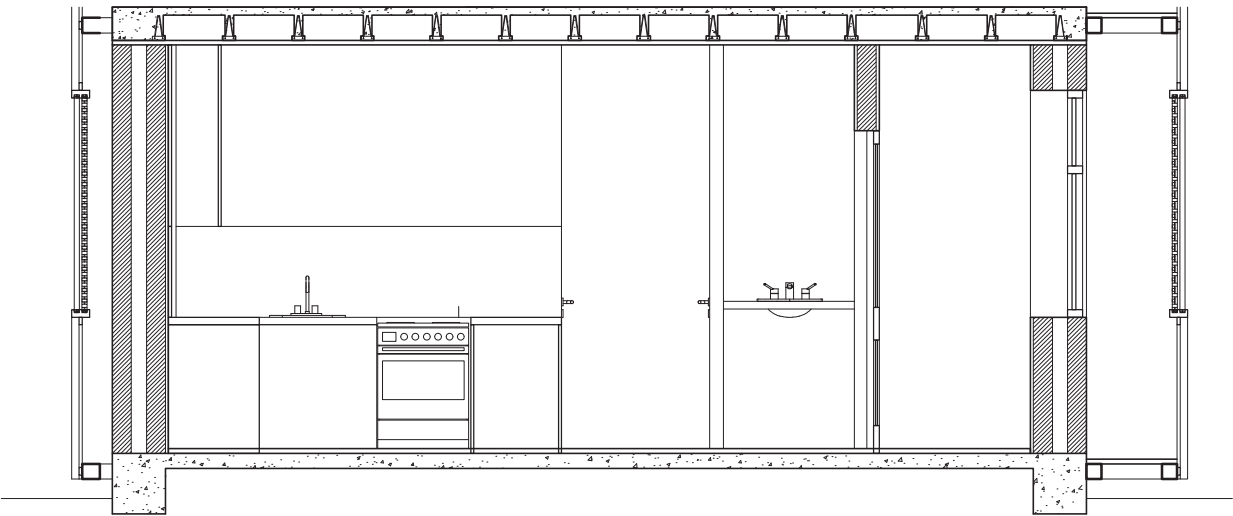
Section through kitchen and bathroom. Scale 1:50.
